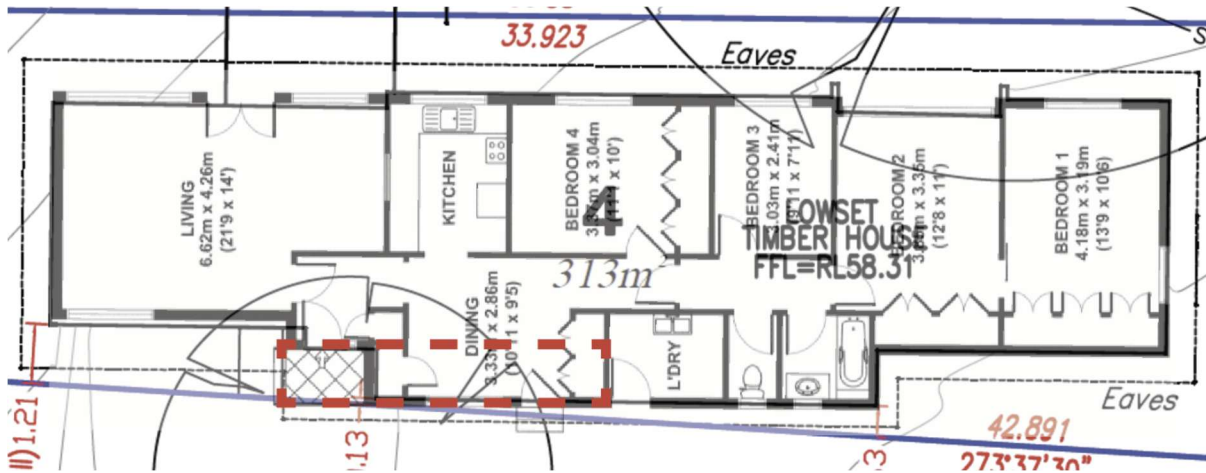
Demolition plan showing extent of ground level of house to be removed. Not part of this application.
